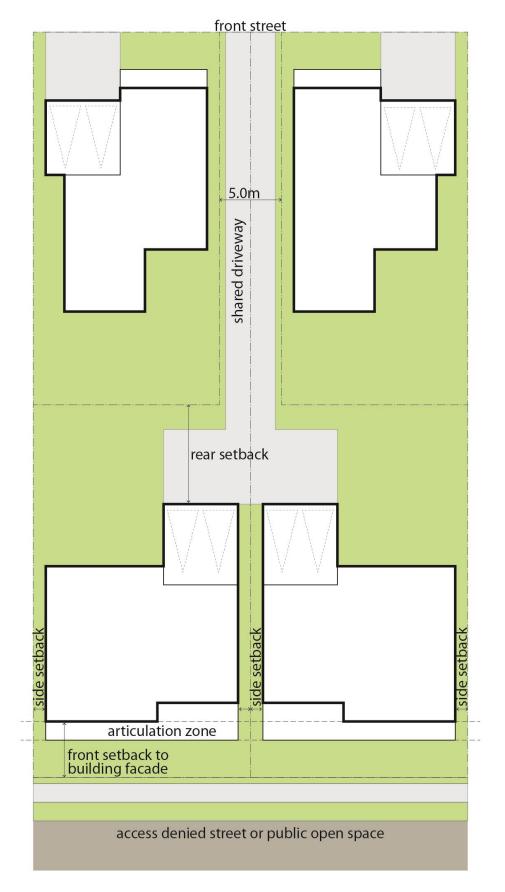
Battle-axe lot (fronting access denied road) setbacks
